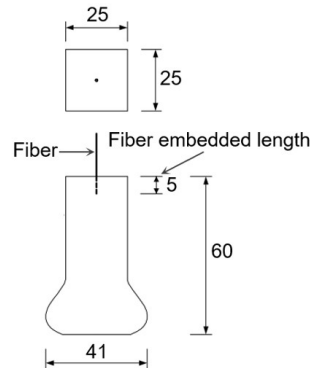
Pullout specimen geometry (unit: mm) (Dang & Kim, 2023)
